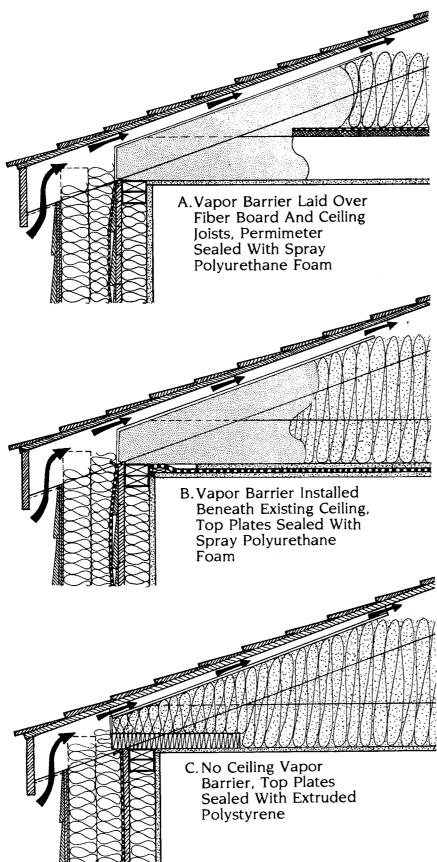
Exterior wall retrofit with an interior attic retrofit.
